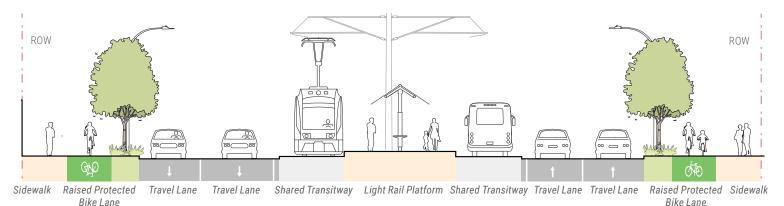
DRAFT Hamilton Street Station Cross Section
